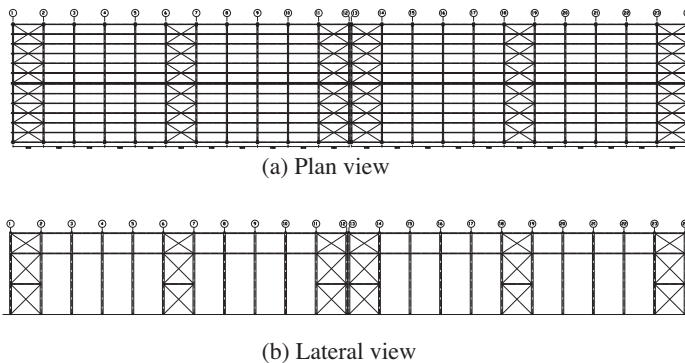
Alternative arrangements for the vertical bracings
